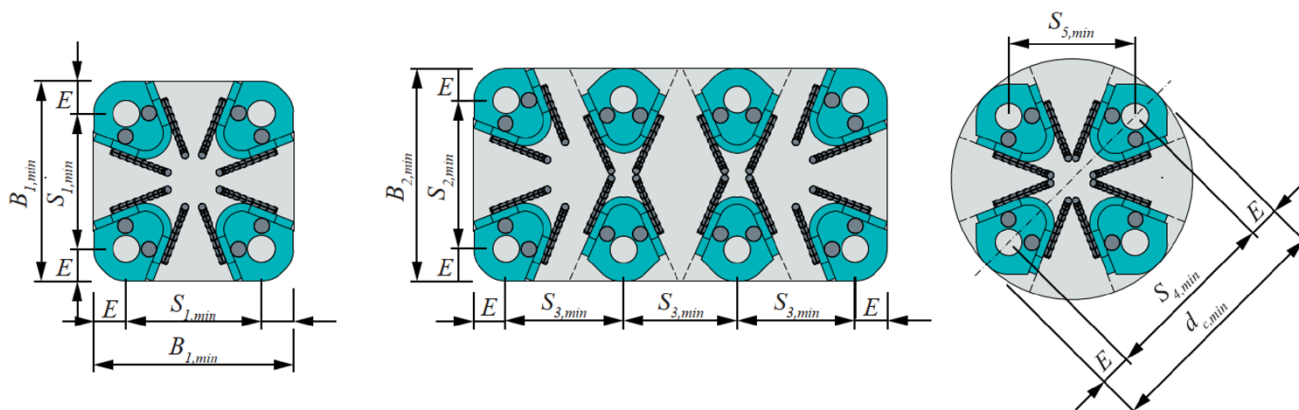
Examples of geometries and minimum spacings of BOLDA Column Shoes
